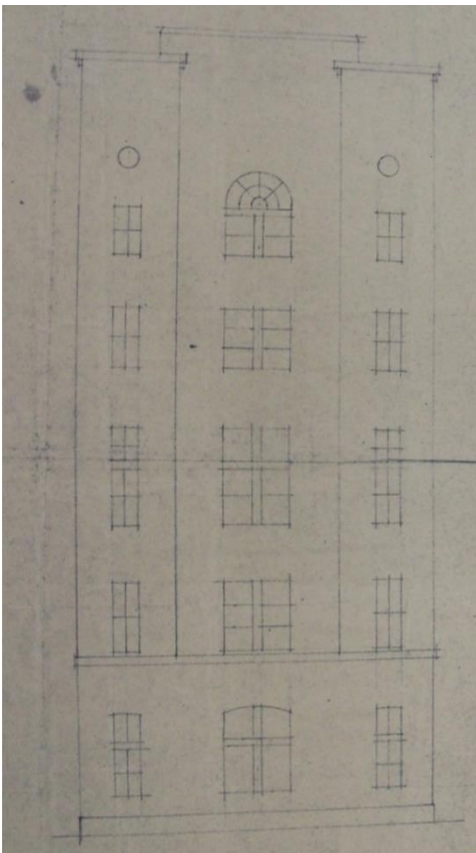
Elevation drawings showing windows of Irving Street Brewery buildings: East façade of building 22 by the Department of Building Materials, Drawing No. M24708 dated 28-04-50
